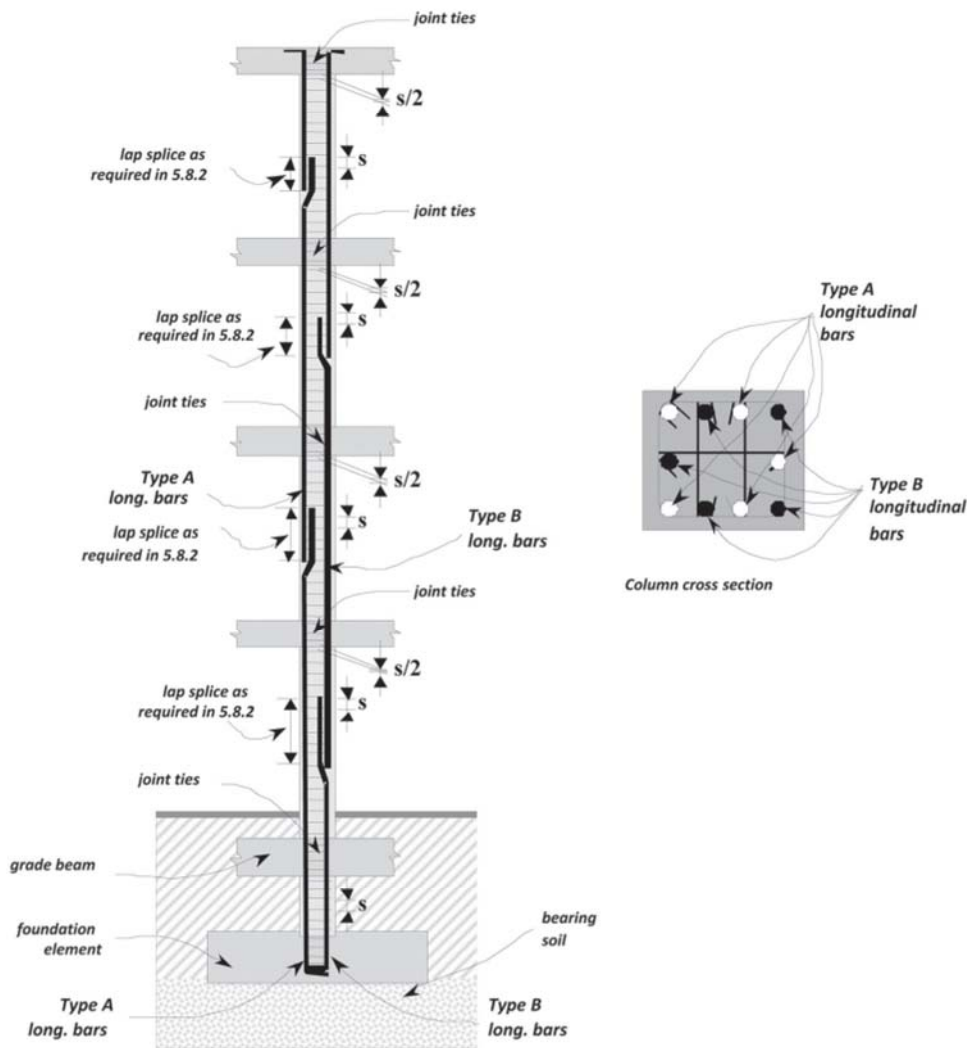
Typical column reinforcement layout in high seismic zones.
